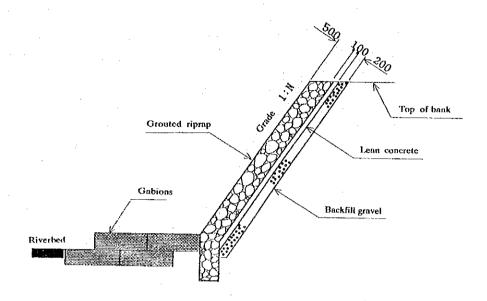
TYPICAL RIVERBANK PROTECTION
